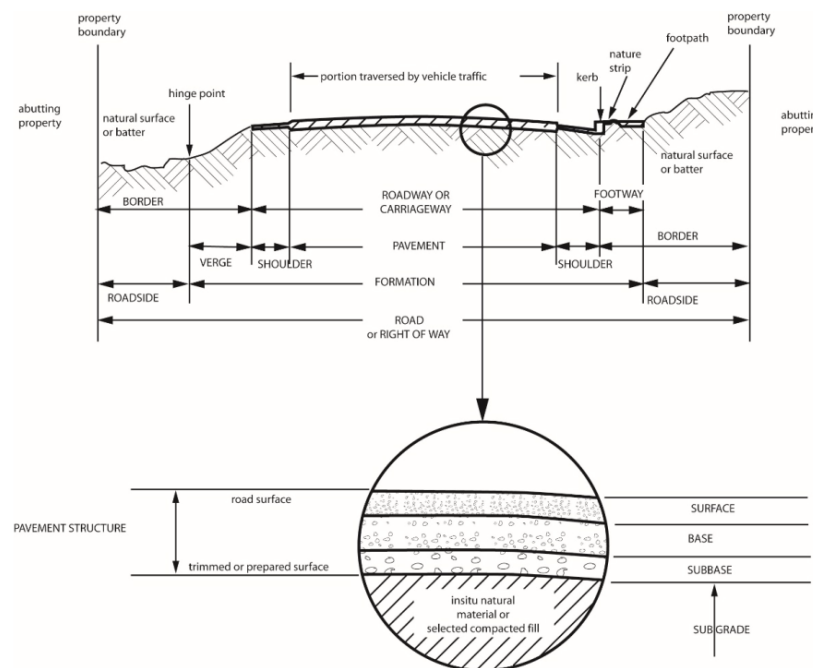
Components of a Road Pavement - Extract from MRWA ERN 9
